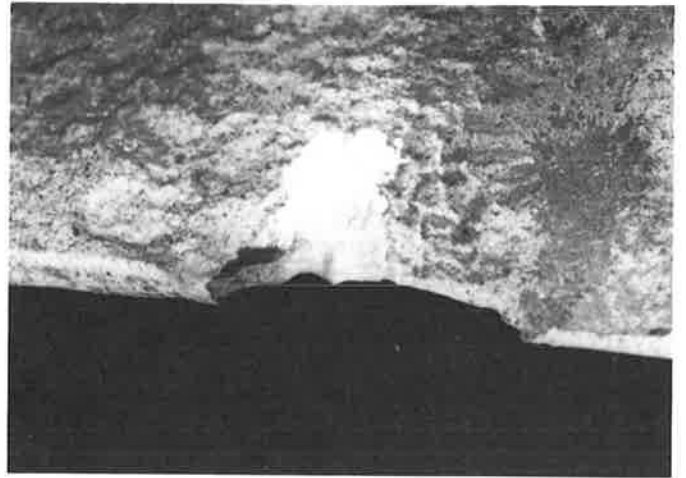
Severe Corrosion Notching of Flange Tip
